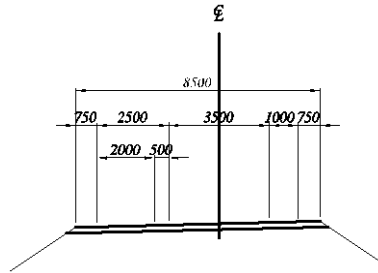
Typical Cross Section for Ramp (1-lane, Earth Work)
